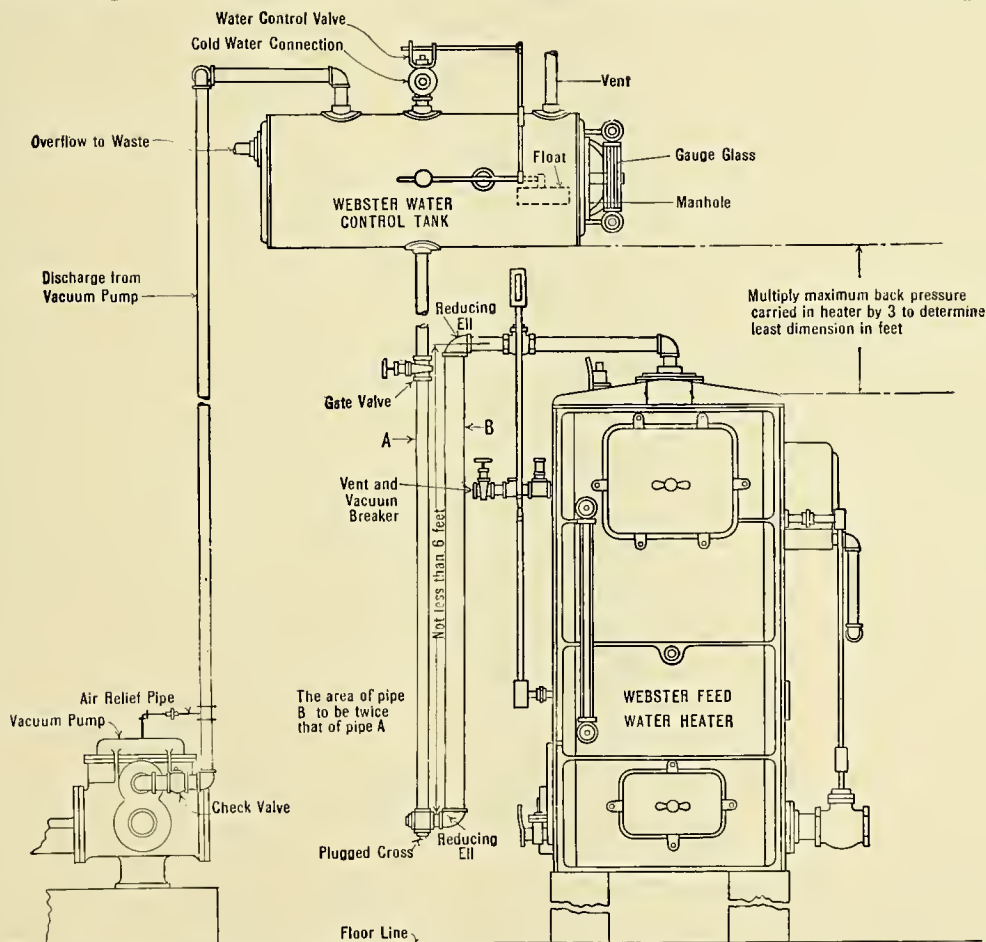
Typical application of Webster Water-control Receiving Tank in connection with an open feed-water heater. The heater should be set on a foundation of sufficient height (a vertical rise of not less than three feet) between the pump outlet of the heater and the suction valves of the boiler-feed pump
